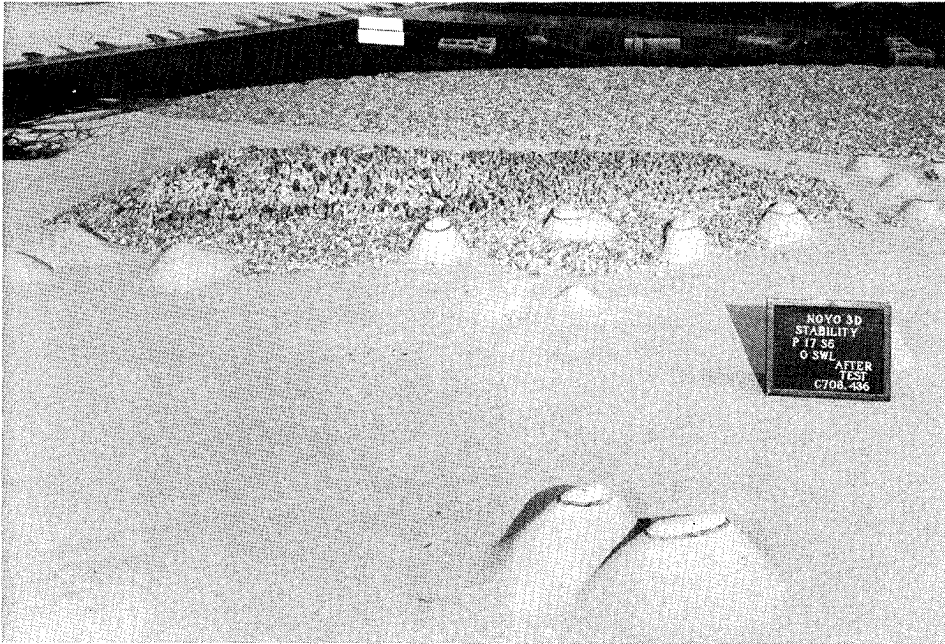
Sea-side view of Plan 17 after five series of modified Storm IB waves
